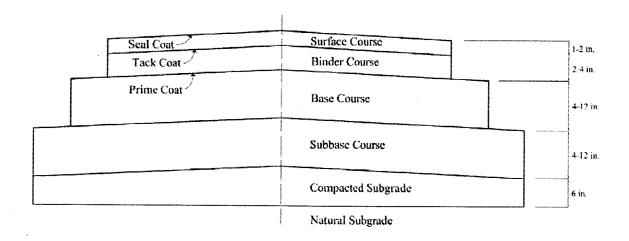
Typical Cross Section of a Conventional Flexible Pavement.
